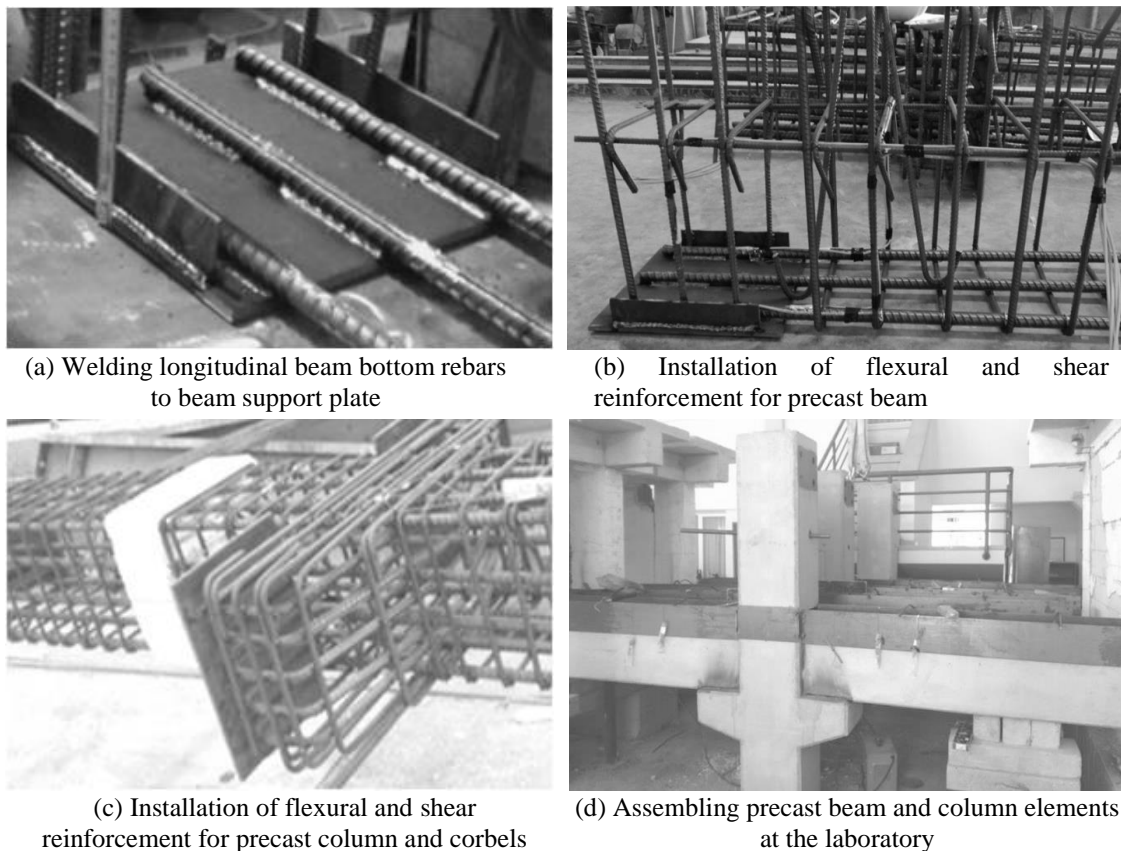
Construction process of interior precast beam-column connection specimens (Girgin et al., 2017a)
